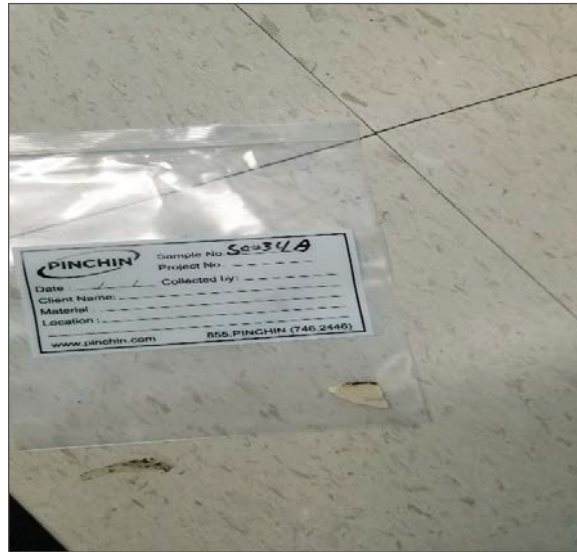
Non-asbestos vinyl sheet flooring within the utility room Loc.53 (Rubber).
